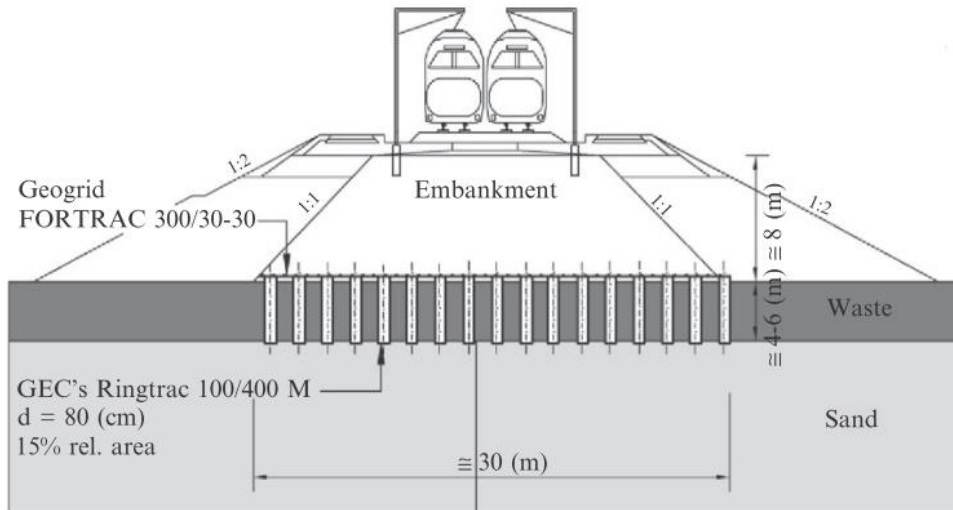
Railroad cross section (Alexiew et al., 2015).
